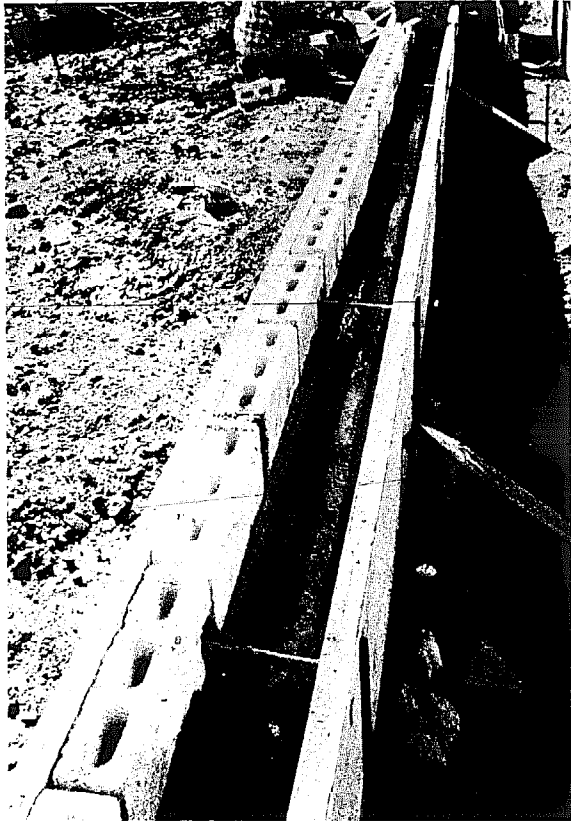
General view of partially completed curb wall, illustrating wood form work, rough gutters and concrete blocks. Note that at each tie wire, a bottom portion of the concrete block had to be chipped away. As noted in text, subsequent courses of concrete blocks were placed after tie wires had been removed
